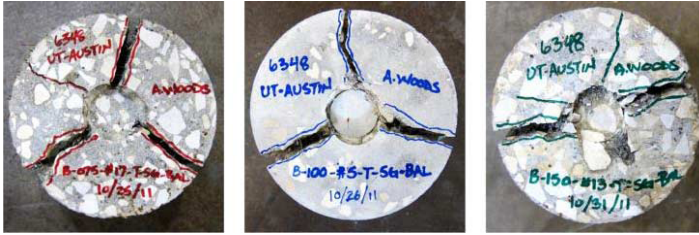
Typical damage and cracking pattern of DPT specimens with steel fibers [8]
